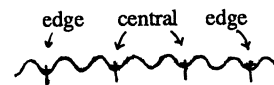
Typical Cracks Observed on Corrugated Roofing
